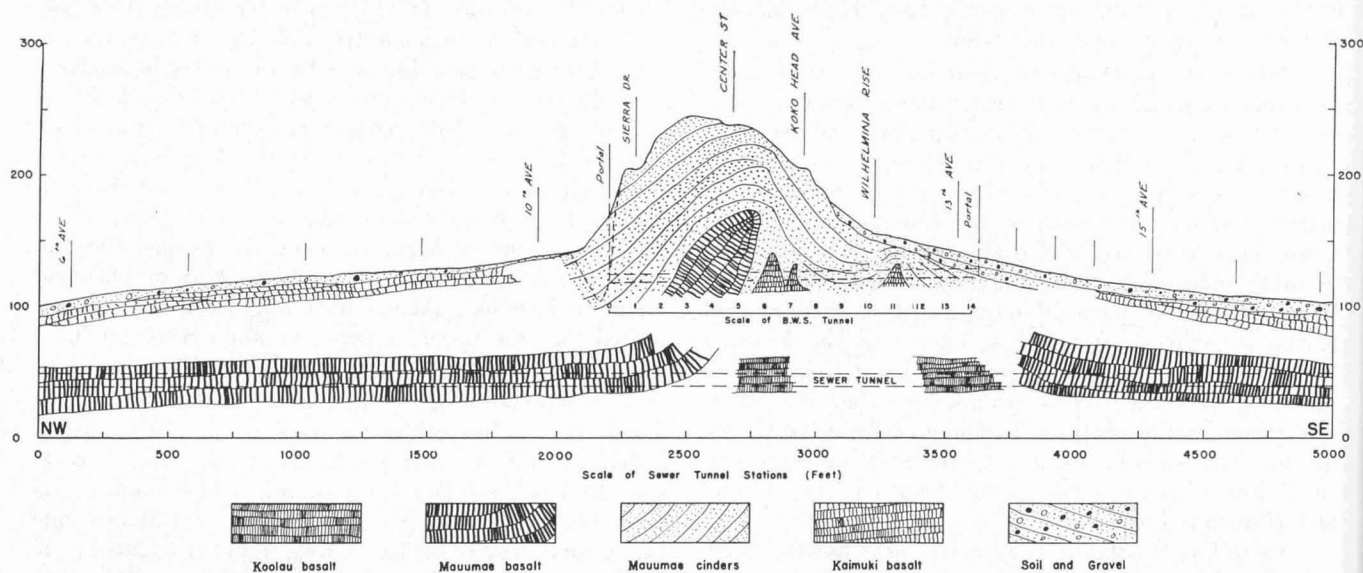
Geologic section along Keanu Street, one block inland from Waialae Avenue. Based chiefly on the water-main tunnel of the Board of Water Supply at approximately 120 feet elevation and the sewer tunnel at 40 feet elevation, interpreted in the light of available surface data. The highest peak and central vent of Puu Mauumae are 600 feet inland, back of the line of the section, and the mass of Mauumae cinders, erupted after the extrusion of large amounts of basalt that underlie the Kaimuki lava, surmounts the lower end of the Kapahulu spur of Koolau basalt adjacent to Palolo Valley.
